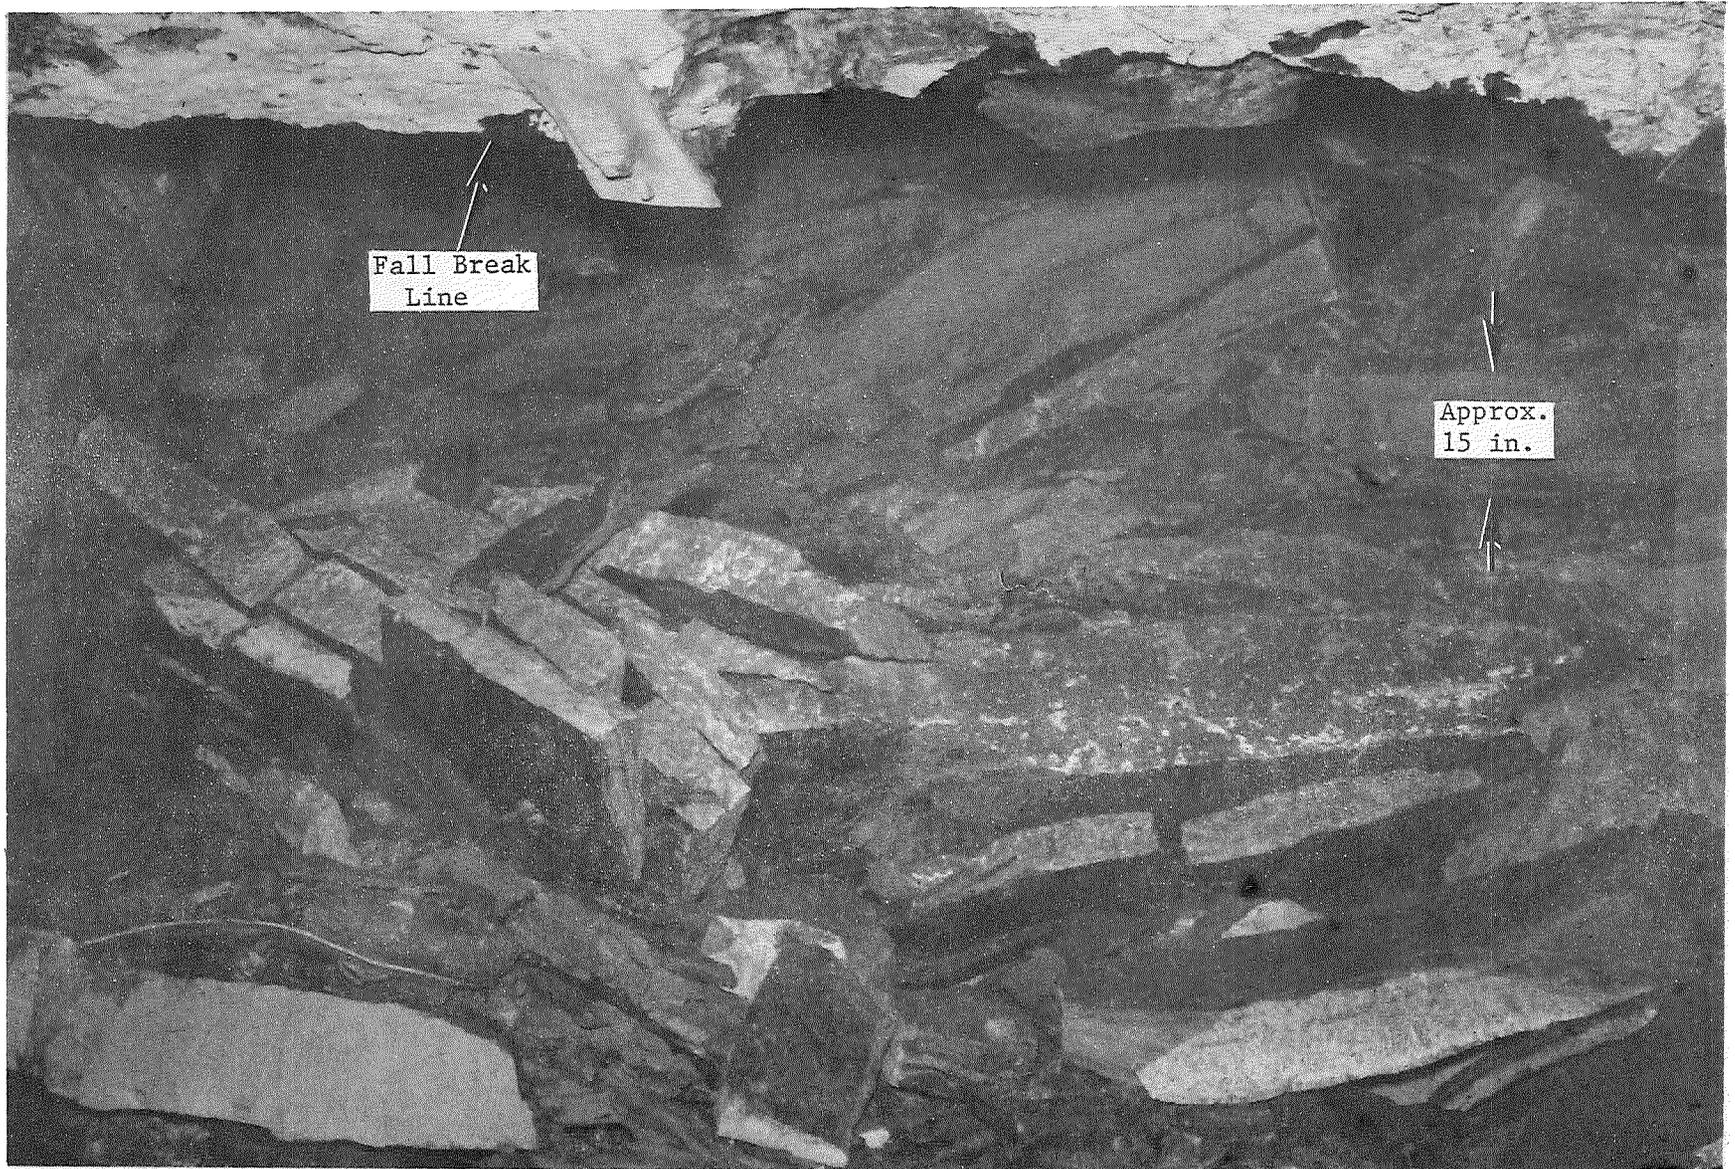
Roof Fall That Occurred at 0900 on December 19, 1978.
